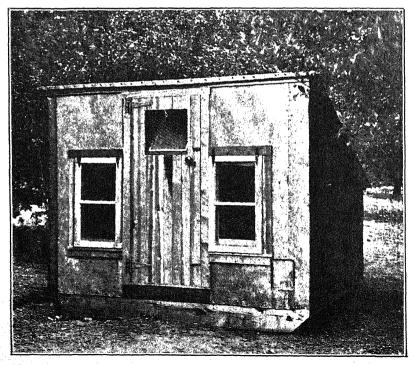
Shed-roof colony house for chicks or mature fowls.
